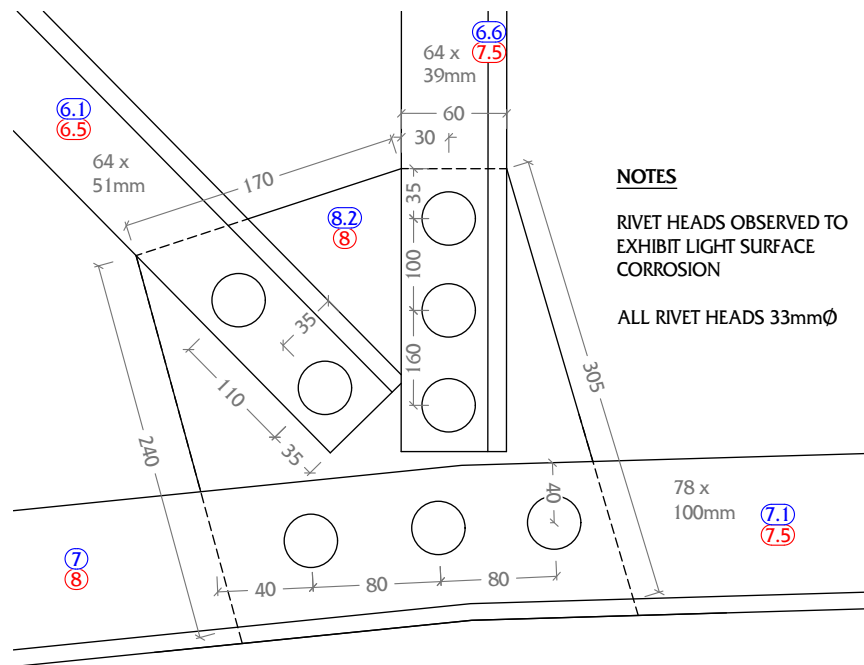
PART ELEVATION SHOWING RIVET SPACINGS AND ELEMENT SIZES AT LOCATION 12 ON TRUSS H NOT TO SCALE
